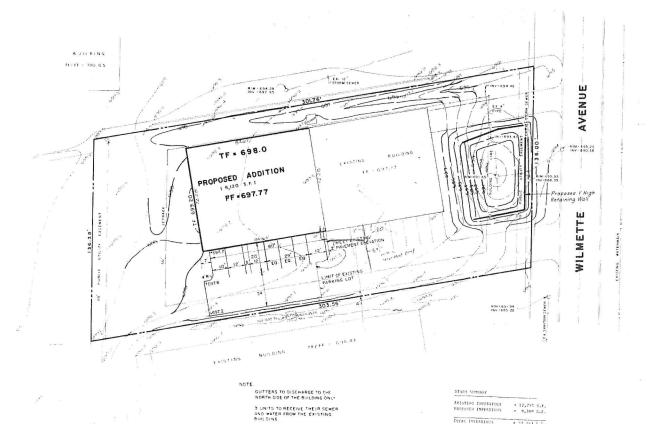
EXHIBIT A SITE PLAN 8408 Wilmette Ave. Darien, Illinois Spoo CAH OXHAUSTEAN SPACE 2 SPACE 3 WAREHOUSE HAPEHAISE UNIT D UNIT C UNIT B UNIT A TENANT TENANT TENANT (RBR Assoc.) (Kerins Industries, Inc.) 2,000 s.f. 2,000 s.f. 2,000 s.f. 6,000 s.f. (approx.) (approx.) (approx.) (approx.)
